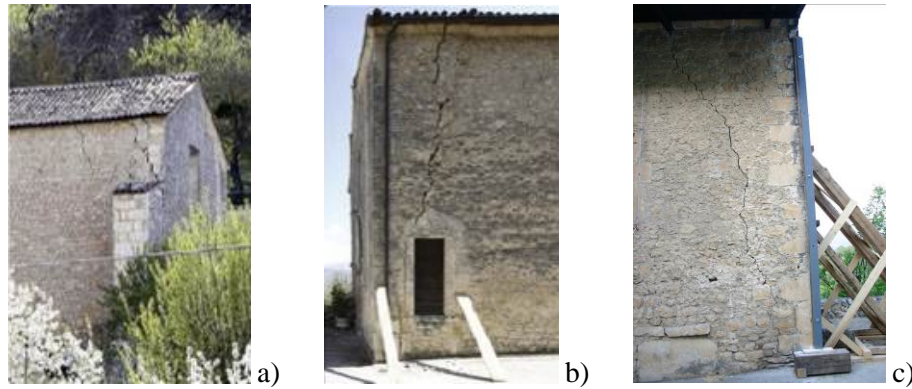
Damages suffered by the Church of Santa Maria ad Cryptas during the L’Aquila earthquake: detachment of the façade from the walls of the nave a) and b); detachment of the apse frontal wall from the rest of the structure c).
